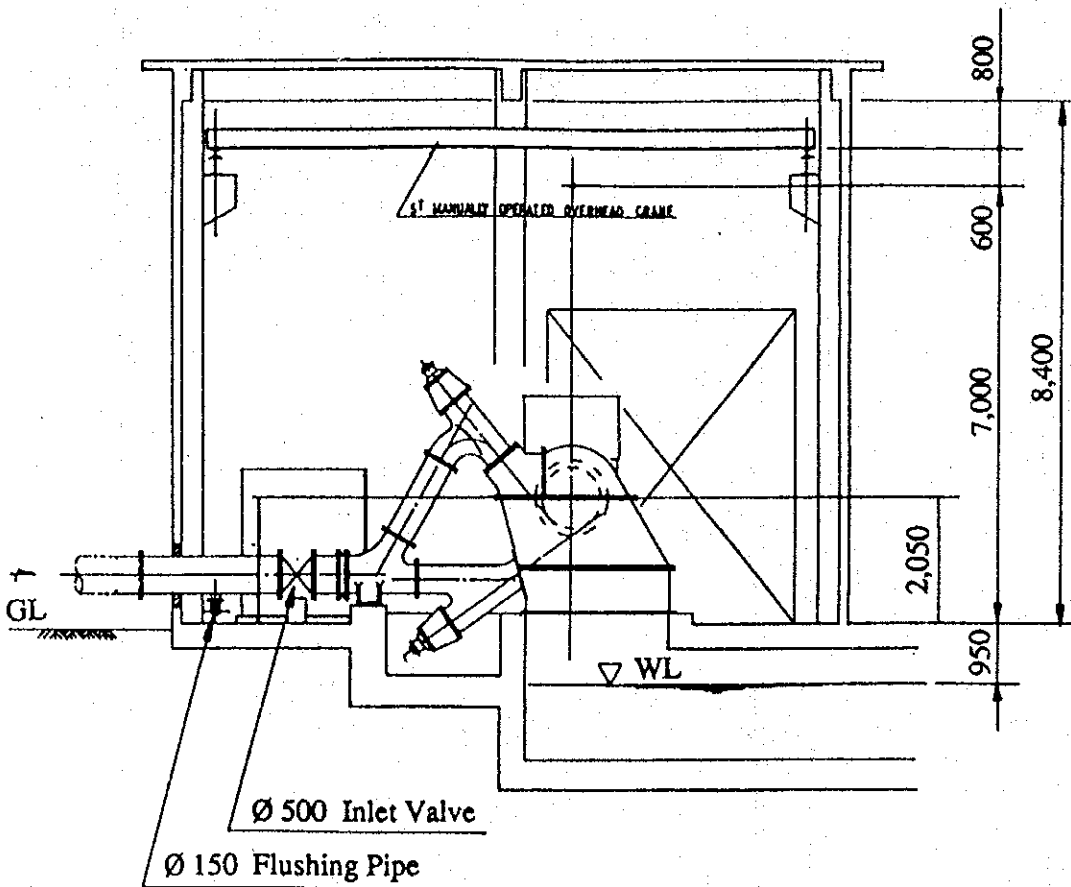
Layout of Cavancha Hydropower Plant
